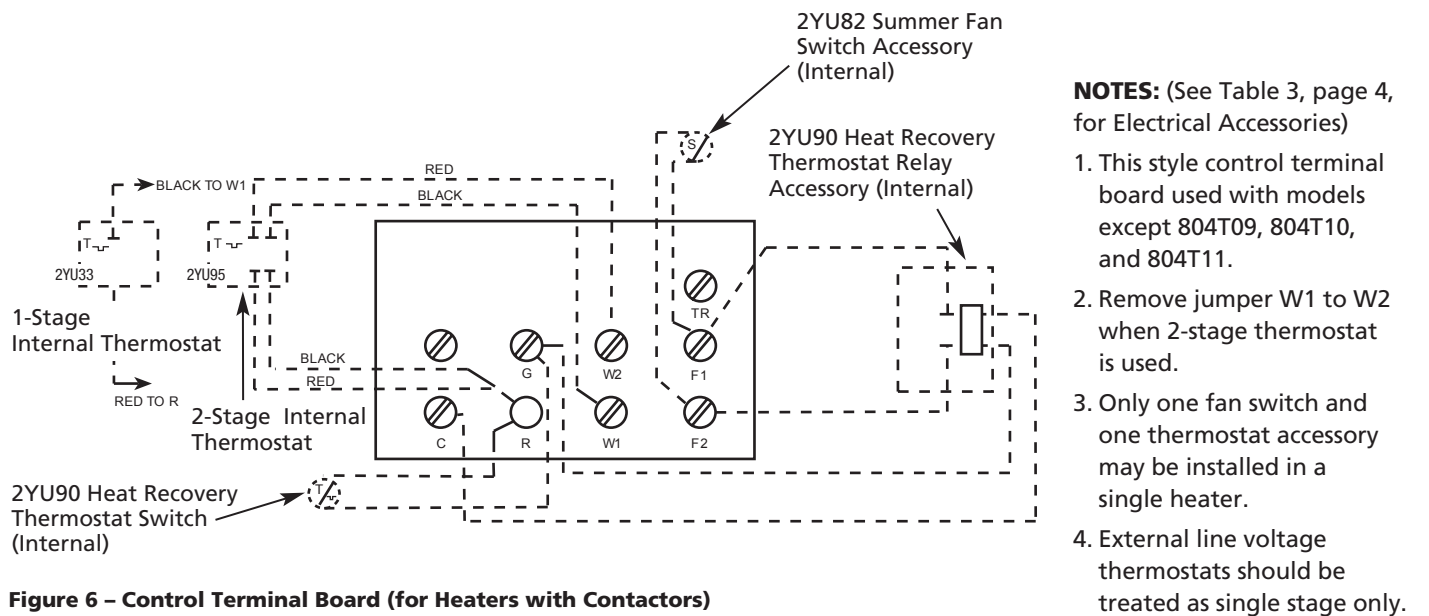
Control Terminal Board (for Heaters with Contactors)
